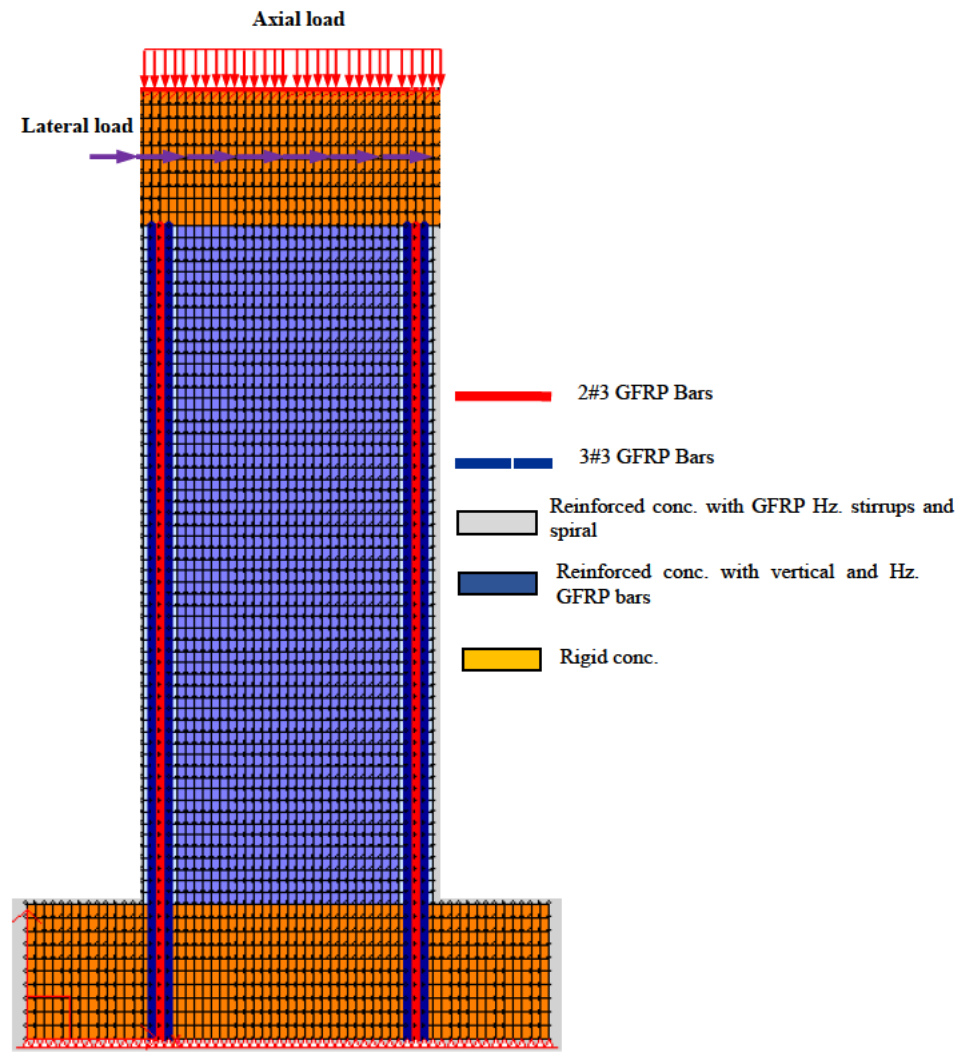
Typical used mesh and truss elements for the modeled wall (GNoX)
